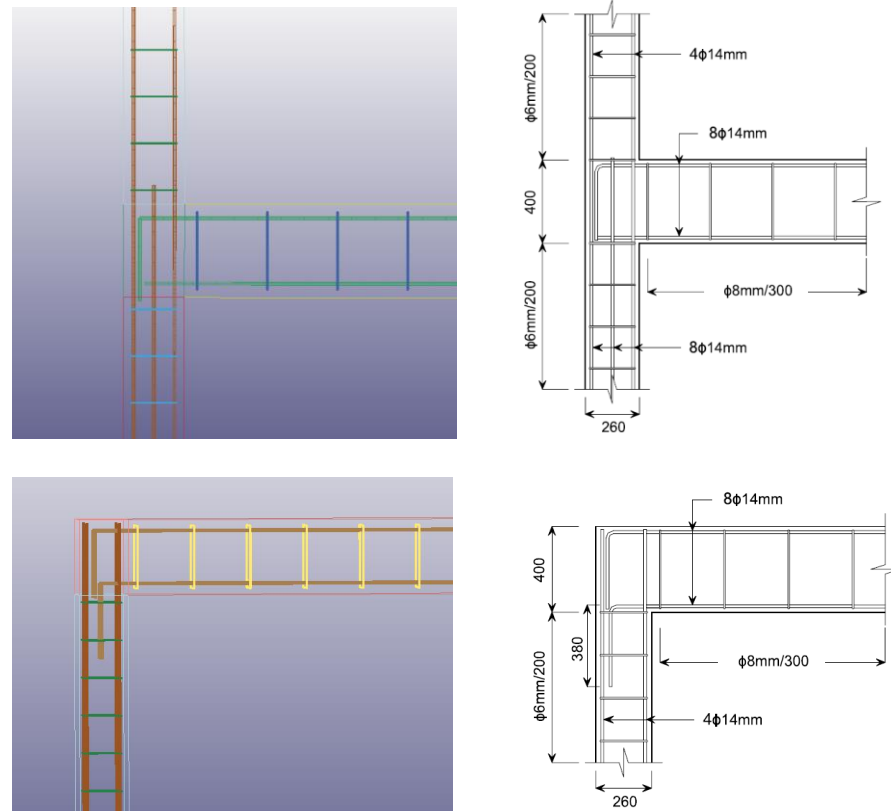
Reinforcement detail in first floor joints in LS-DYNA (on the left), and reinforcement detailing in ECOLEADER experiment by Garcia et al. (2010) is given on the right side of the illustration
